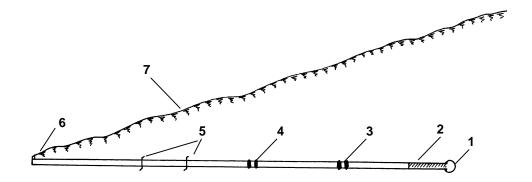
Typical plan of a tunnel for conducting a nuclear charge test: 1-chamber for emplacing the charge; 2- first section of the stemming complex; 3-second stemming section; 4-second, additional stemming section; 5-hermetically sealing walls; 6-tunnel portal; 7-rock massif surface.
